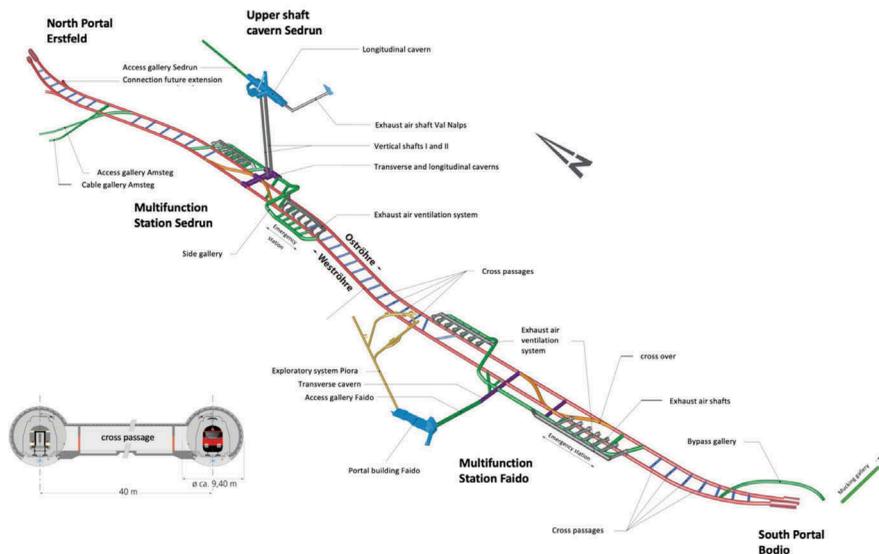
Tunnel System Gotthard Base Tunnel (©Amberg Engineering, STS, 2016).
